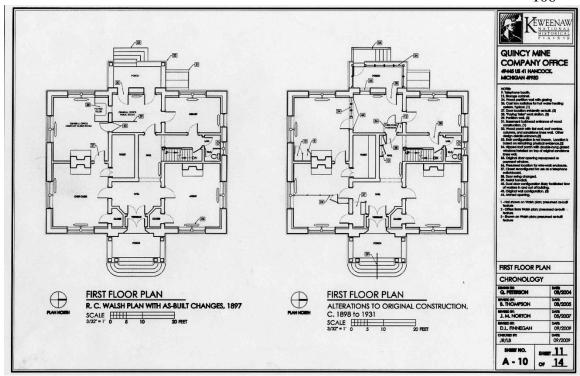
Drawings of original construction and alterations made in early 20^{th} century on the first floor of the QMC office. Note the removal of the pay windows in the southwest corner. Image courtesy of KNHP.
